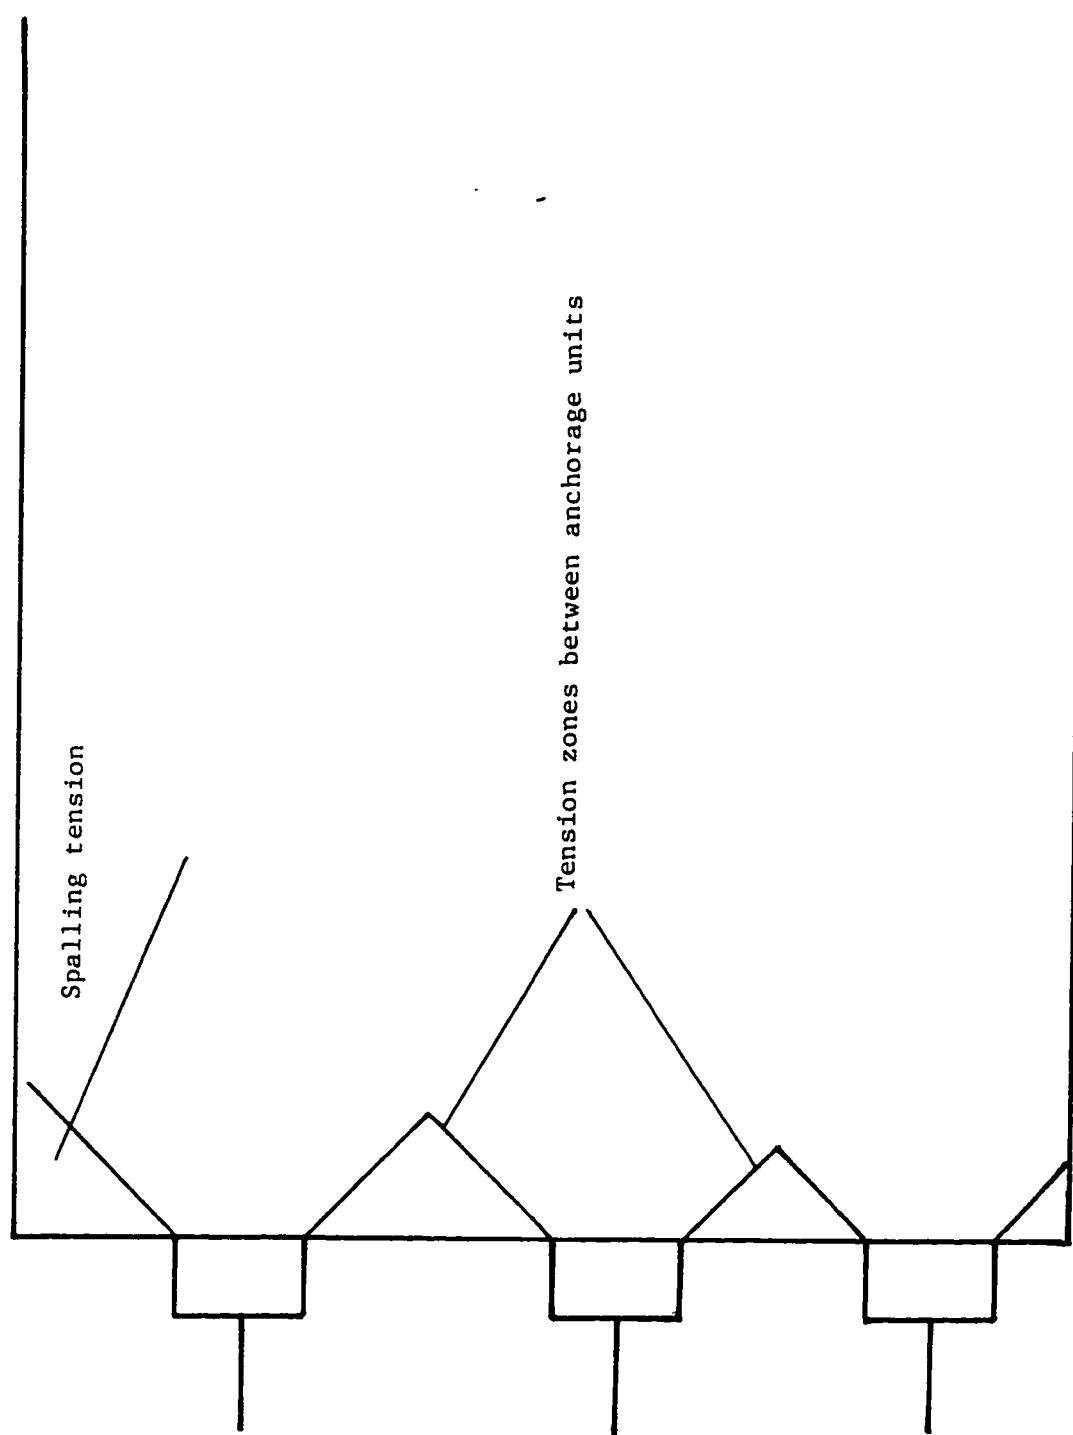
The spalling tension and the tension between anchorage units
